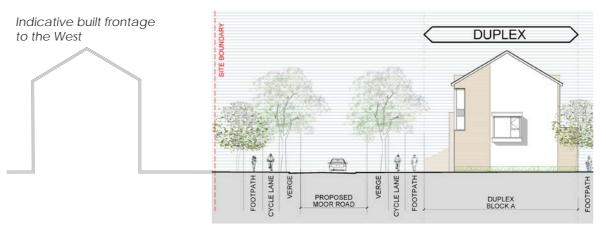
Cross section through the MOOR and elevation fronting the MOOR including duplex and building apartments configuring a strong frontage to the road at the access to the Moygaddy lands. Source: MCORM, 2022.
